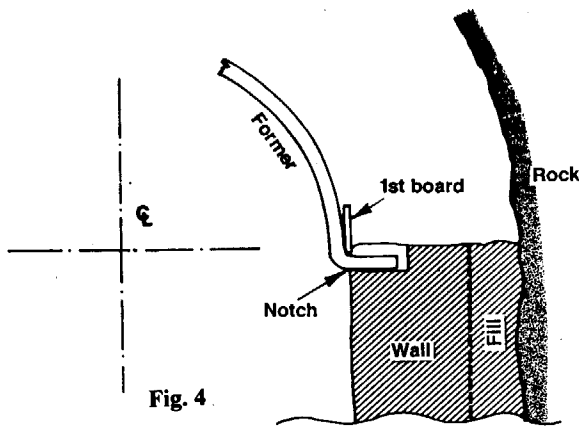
Showing the location of the first board behind the former, its inner face in line with the top of the lower wall.
